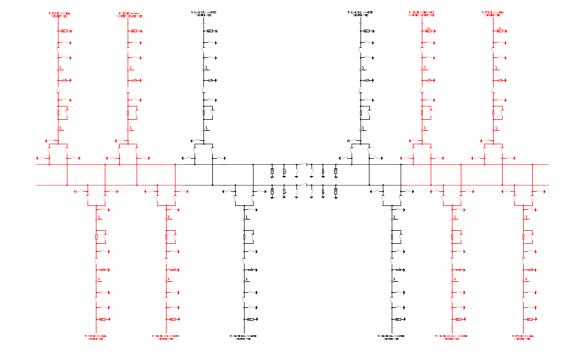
Typical Bus Hall and Bay Hall Arrangement
